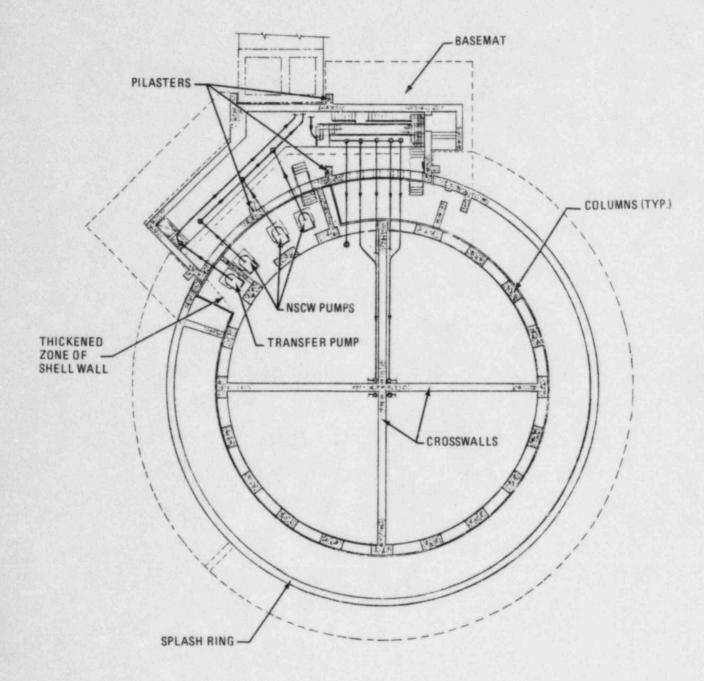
KEY STRUCTURAL ELEMENTS AND MAJOR EQUIPMENT (Sheet 2 of 2)
